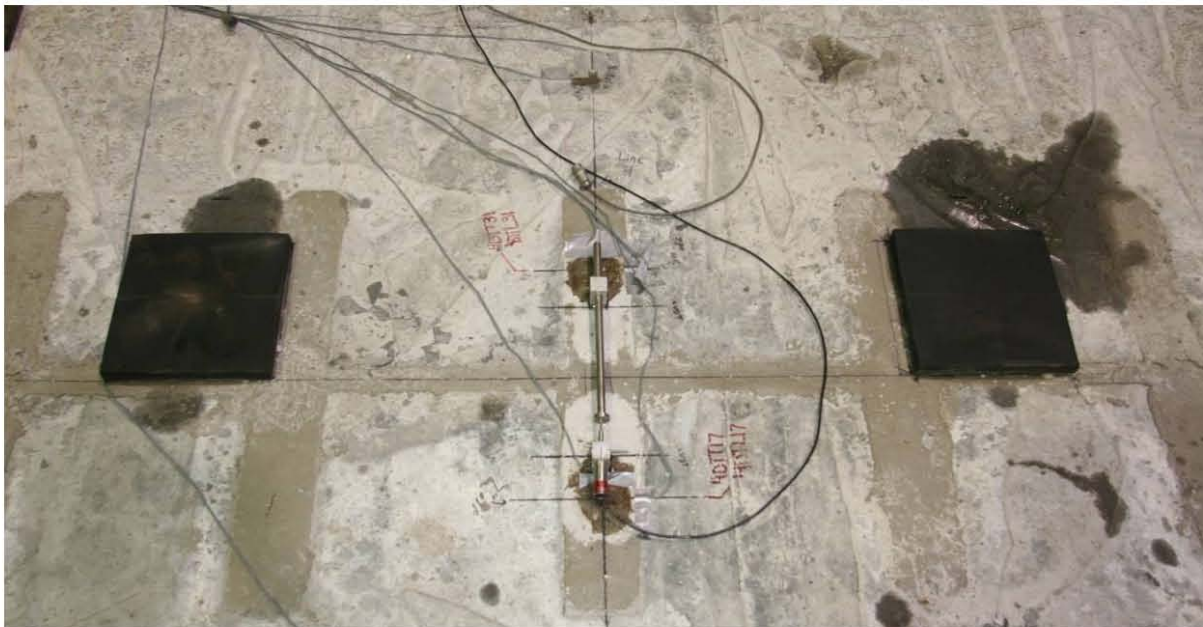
Photo. Elastomeric loading pads abutting the centerline of the grouted joint in Test T2J.
